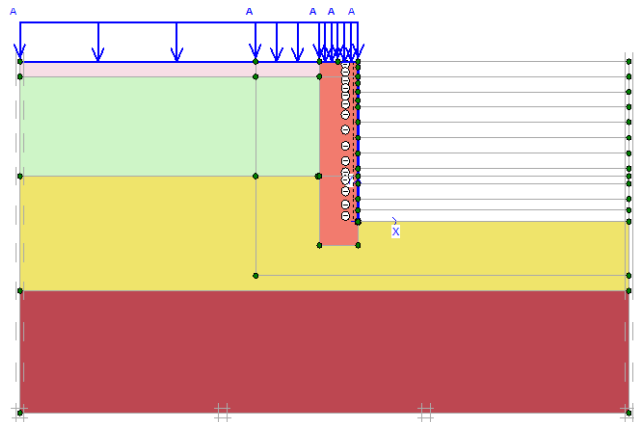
2D Model: transverse wall using the plastic concrete pile method.
